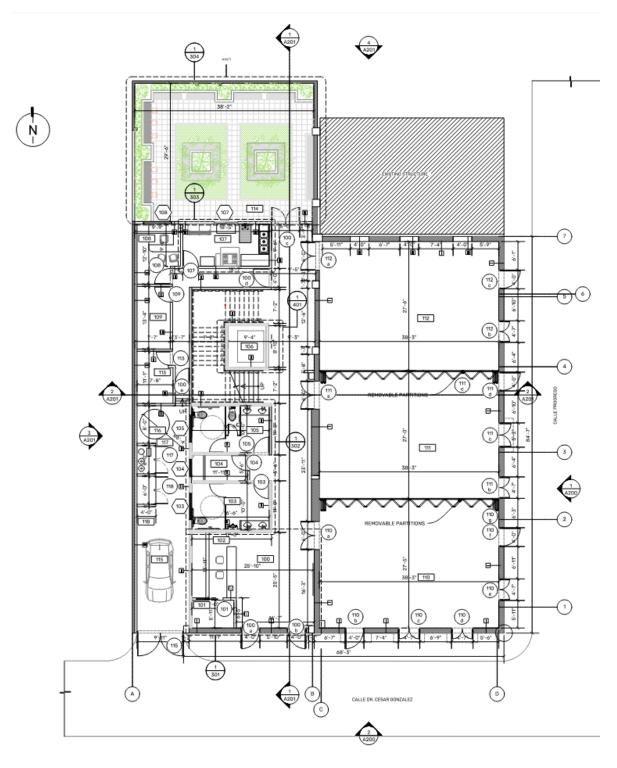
Proposed Ground Floor Plan (Ingenium Group 2023)
